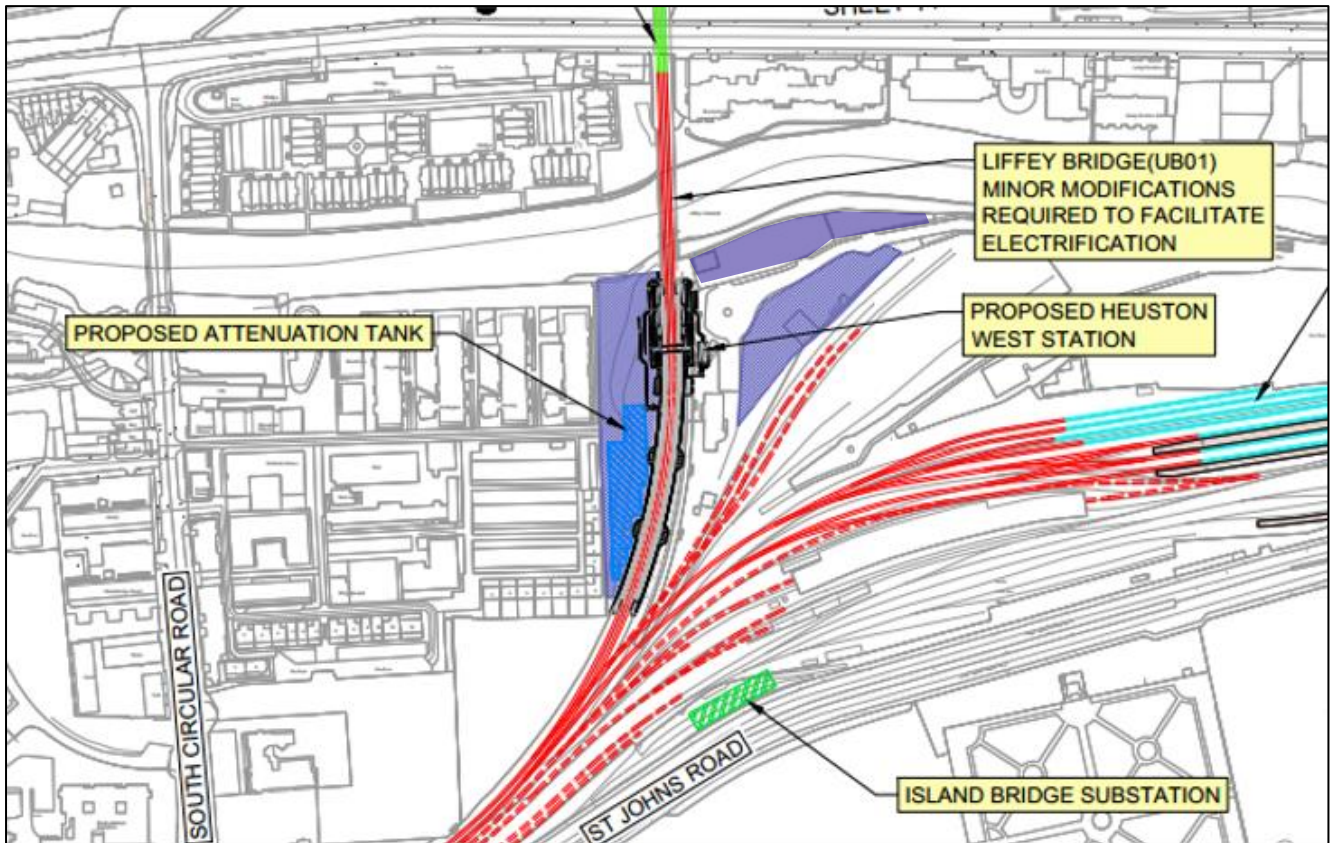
Construction Compound Heuston West – Preferred Option Indicative Site Layout
